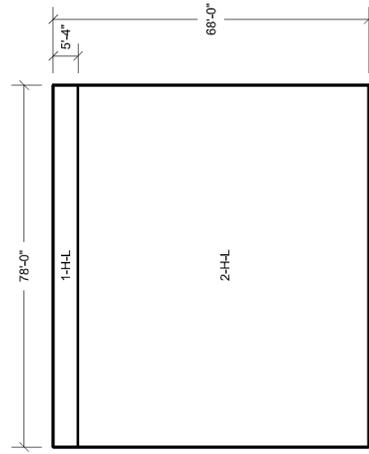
H.6-77: PUMP HOUSE INTERNAL WEST WALL LOOKING WEST
